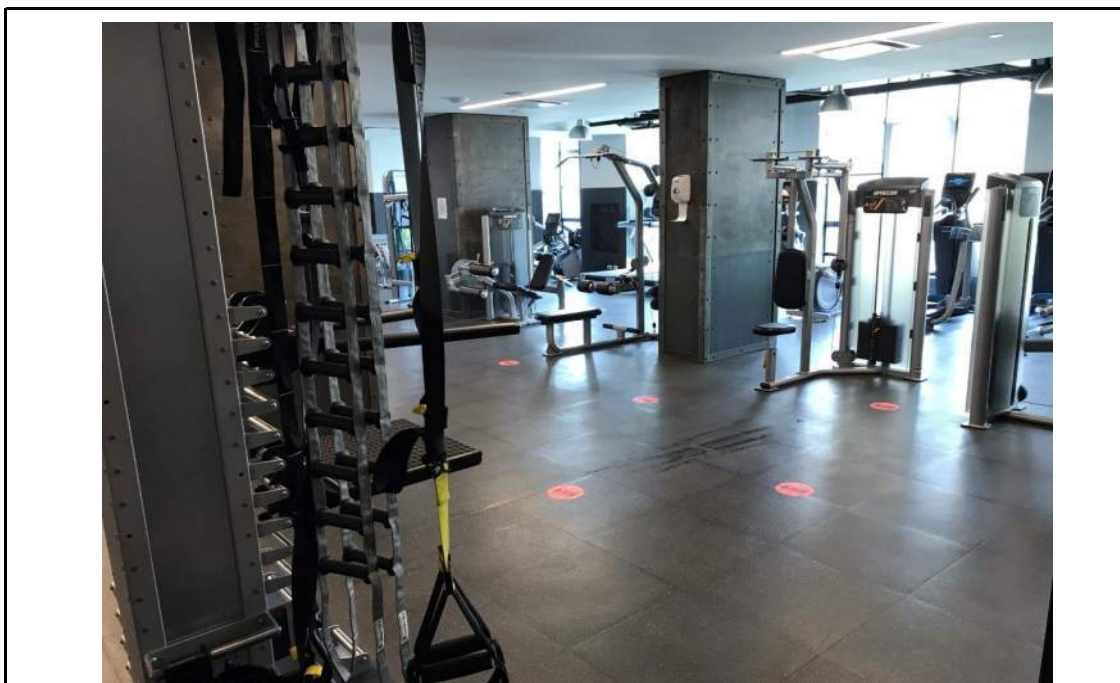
First floor concrete slab covered with soft tiles within the gym, facing east. 21 April 2021.
